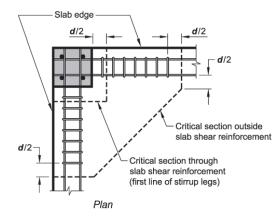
Critical sections for two-way shear in slab with shear reinforcement at corner column.
